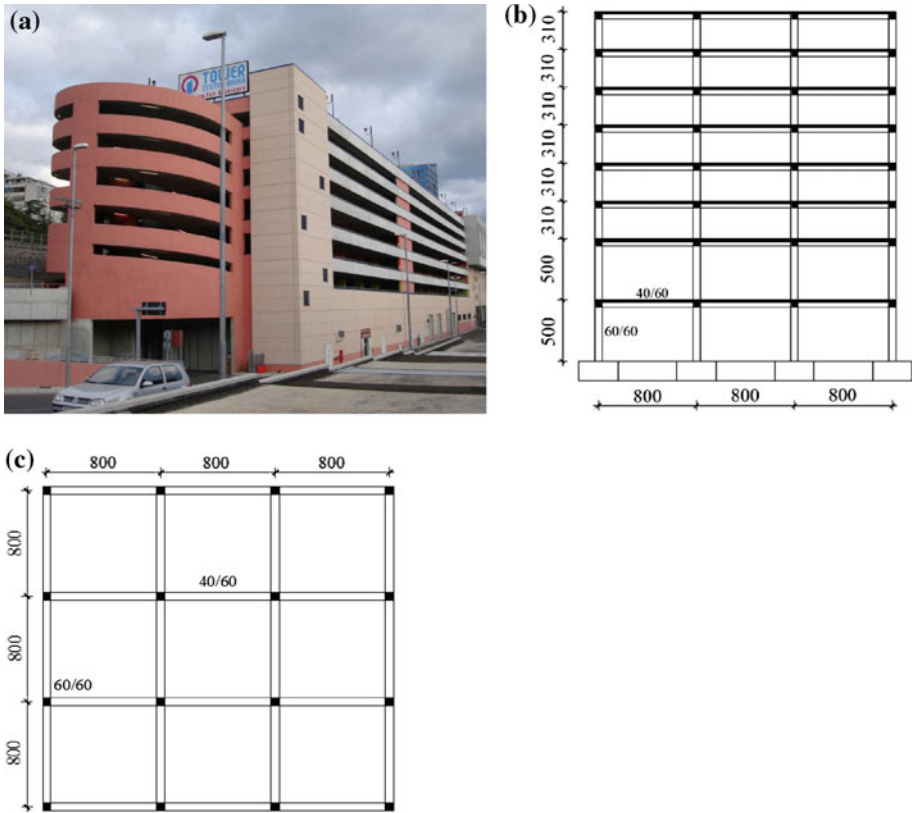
a Building of garage of the Tower Centre, Rijeka, Croatia; b Cross-section and c plan of one segment of the garage structure
